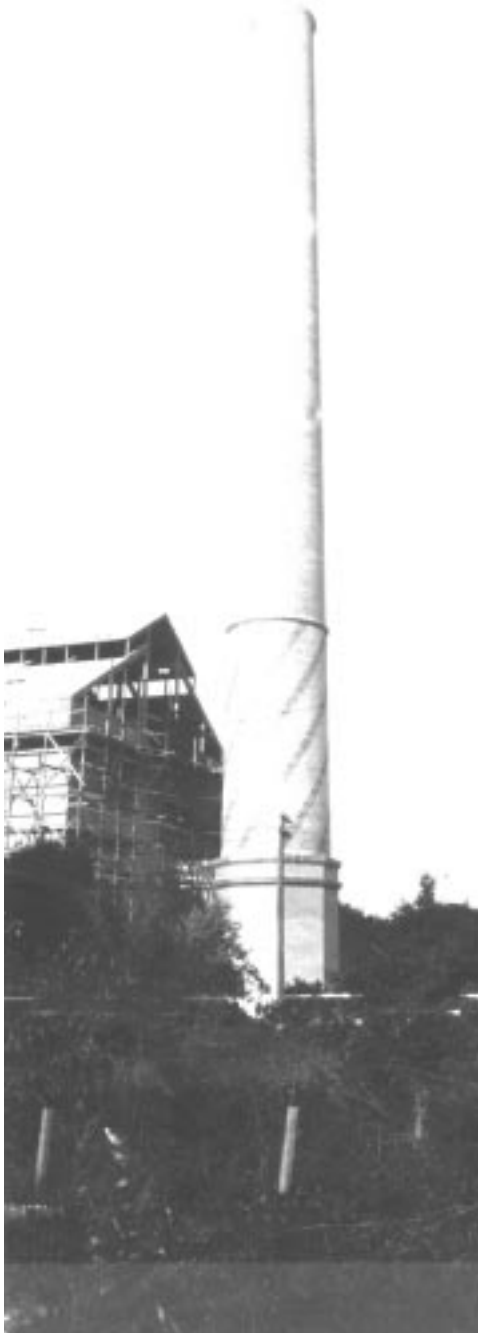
1907, the heating plant during construction, after the chimney is finished, but before the main building is done, taken from the south west. [9/5 Heating Plant, jf-31]
